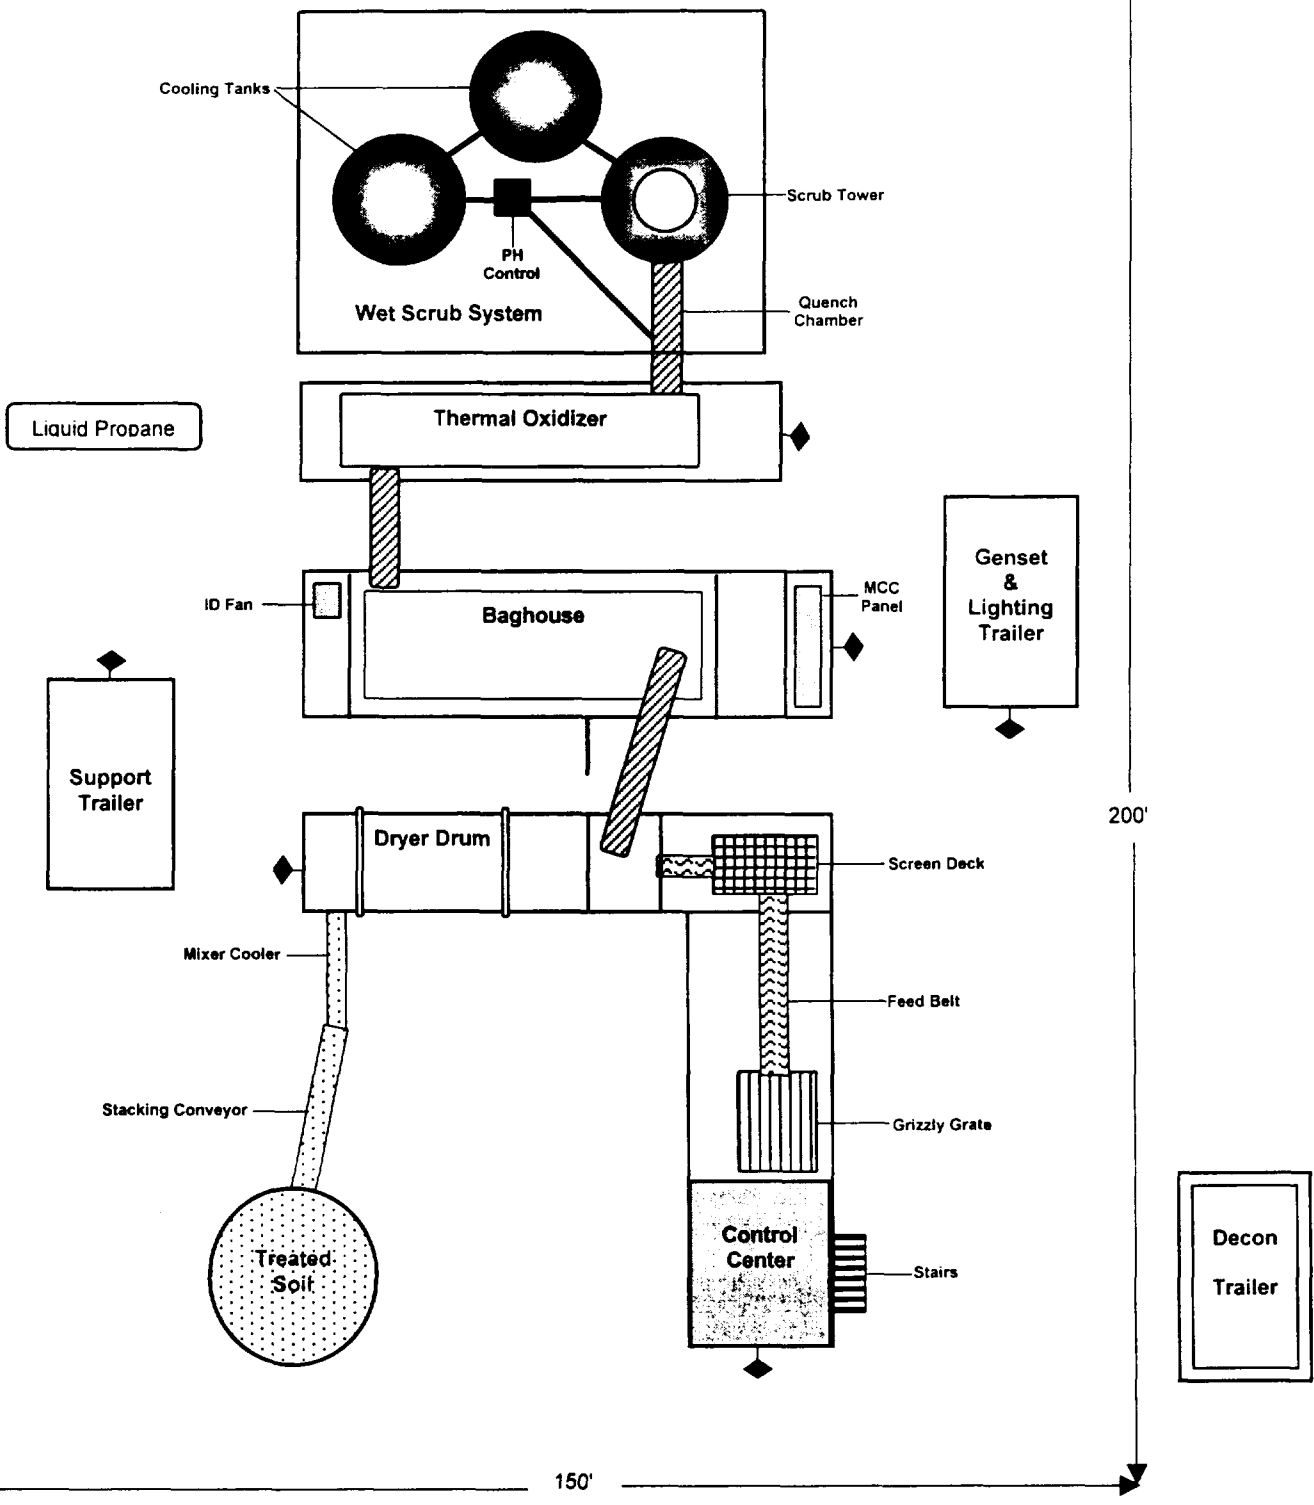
1 -1 Site Plan NOT TO SCALE
